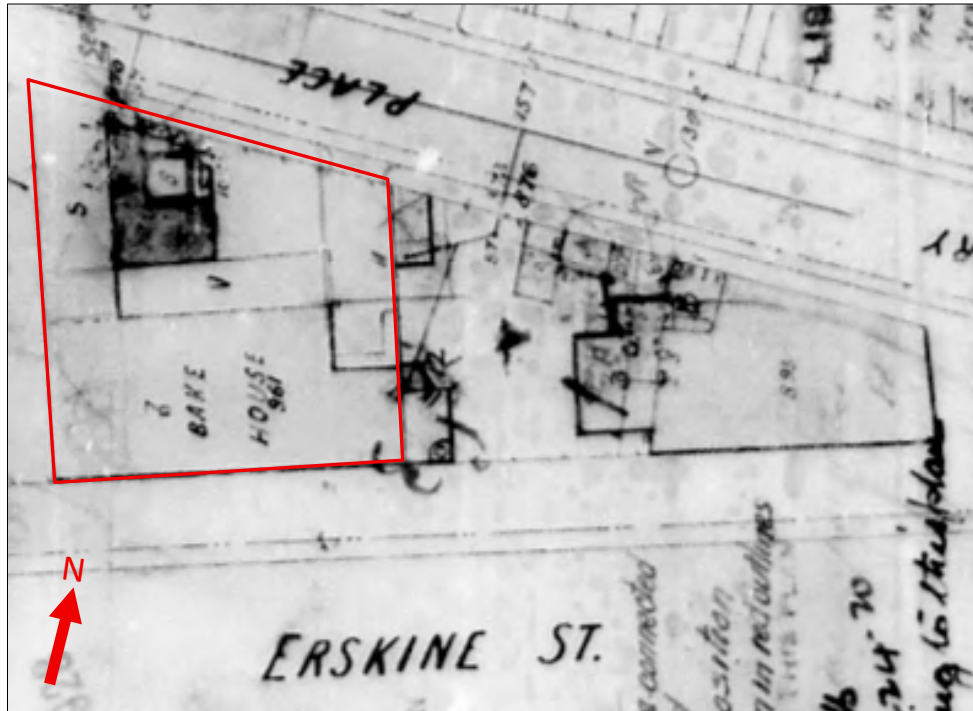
Property service plan, dating to 1917, with the approximate boundaries of the subject site outlined in red. Noting limited change had occurred between the 1895 MMBW detail plan and this property service plan. Source: Southeast Water.
